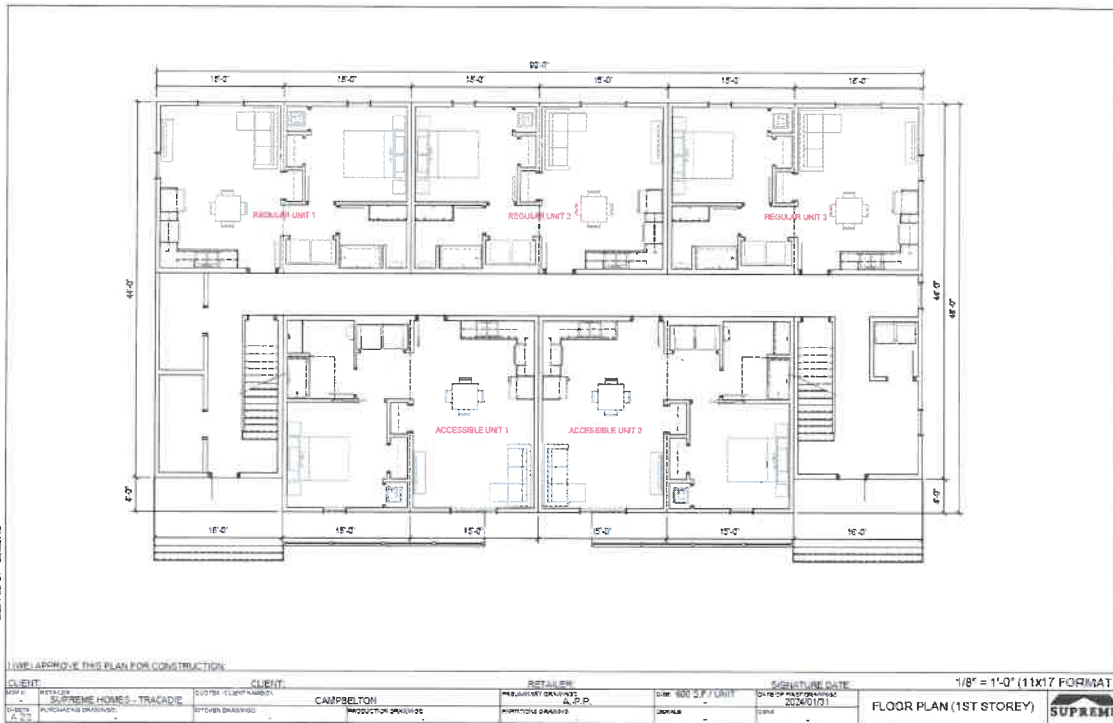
Floor plans (Supreme) / Plans d'étage (Supreme)
